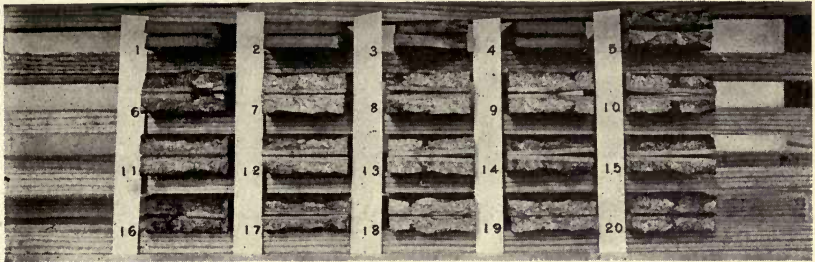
RATE OF WELDING—FIRST SERIES.
